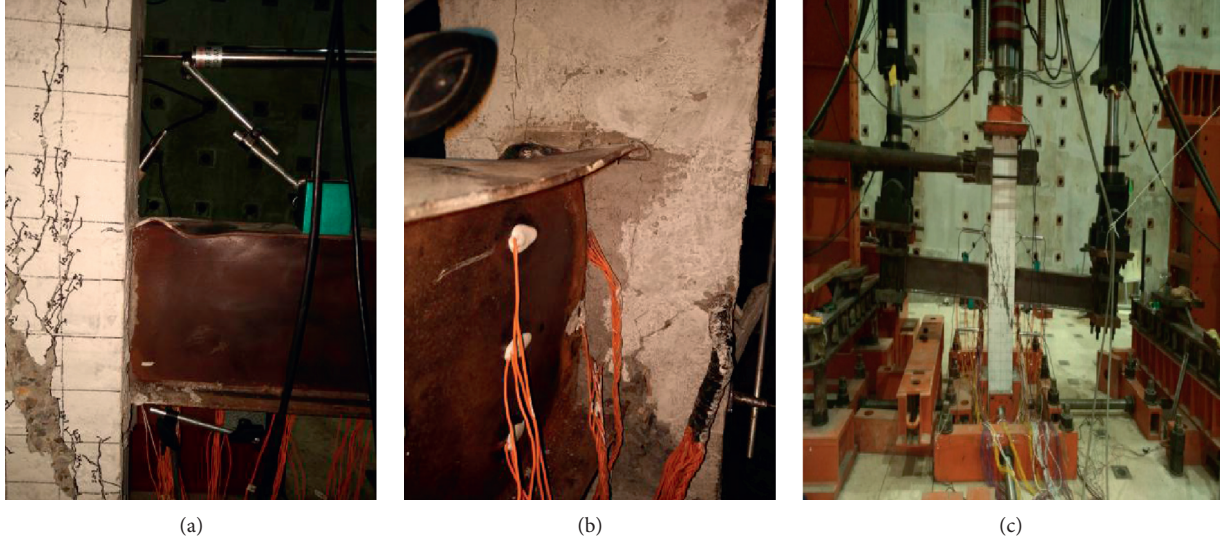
Failure modes of SRC-3. (a) Top flange buckling of beam. (b) Web buckling of beam. (c) Final failure mode.
